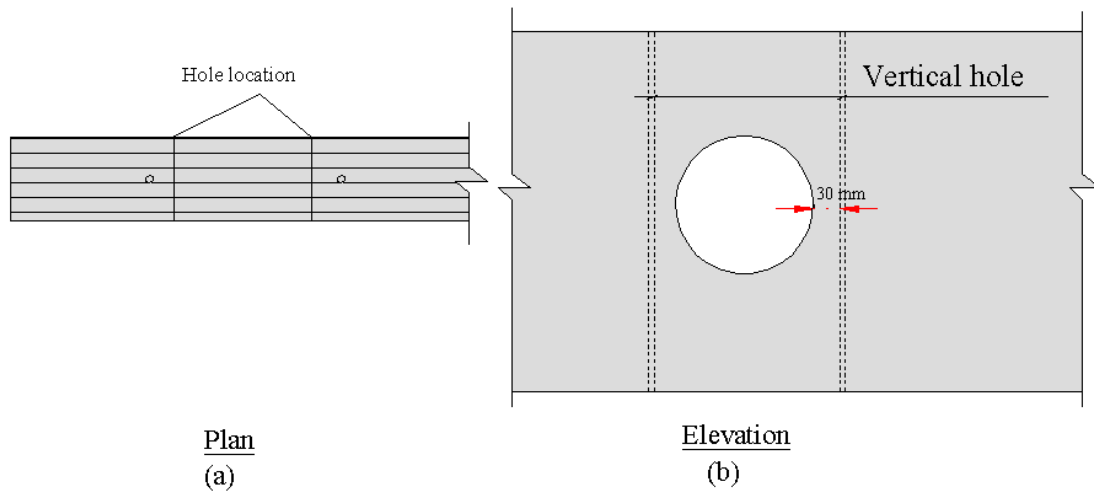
Beam with vertical holes: (a) plan, (b) elevation
